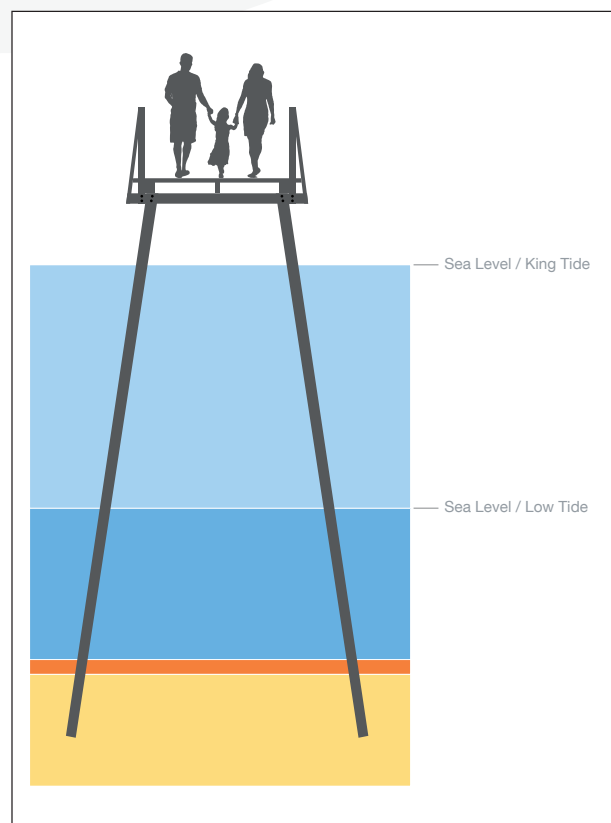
Cross-section diagram of proposed Lea Lea footbridge replacement
